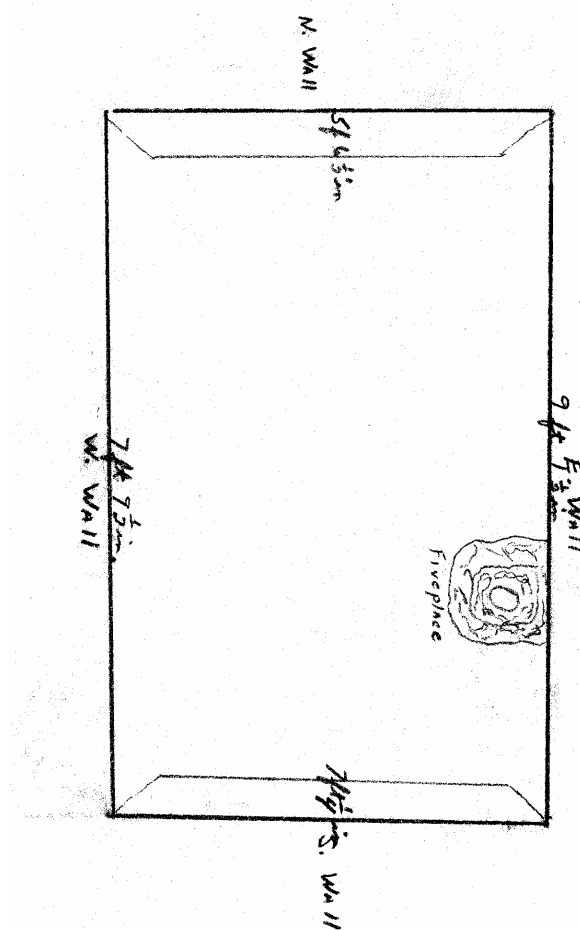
Plan of Room A-22 (3sub2). North is to top of page.
